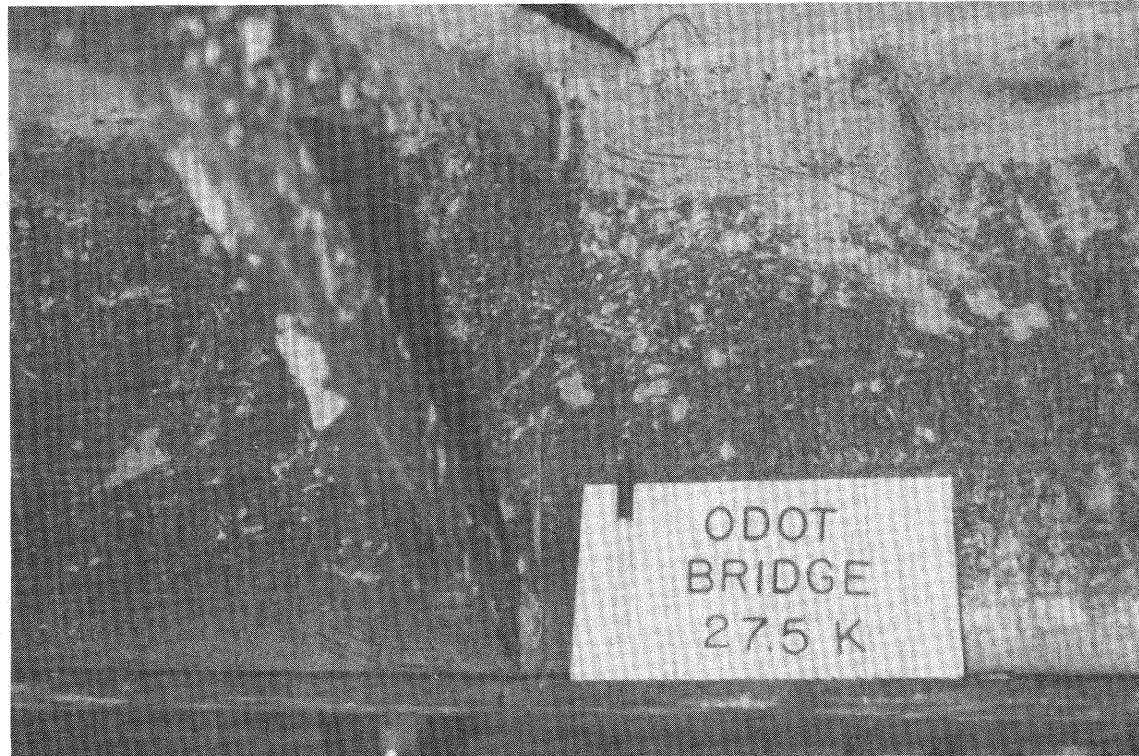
Photograph of Steel Beam Crack
